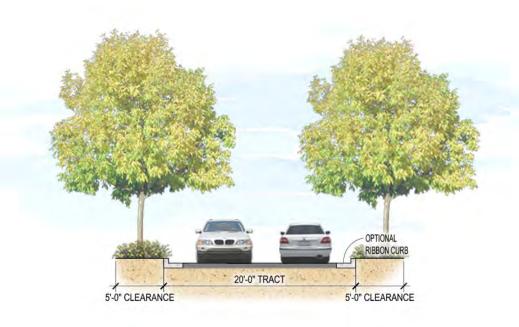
EXHIBIT L: STREET SECTIONS PRIVATE DRIVE/ALLEY (25' TRACT)
